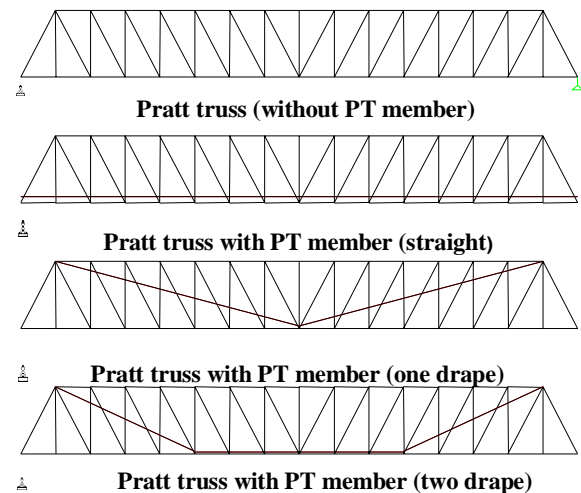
Pratt truss without and with PT members (Straight, One drape and Two drape)
